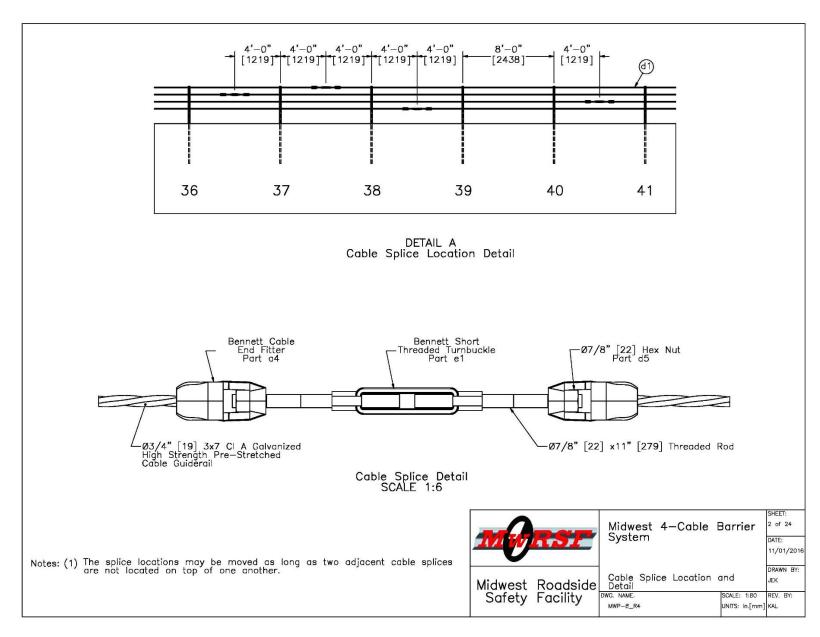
Cable Splice Location and Detail, Test No. MWP-8
